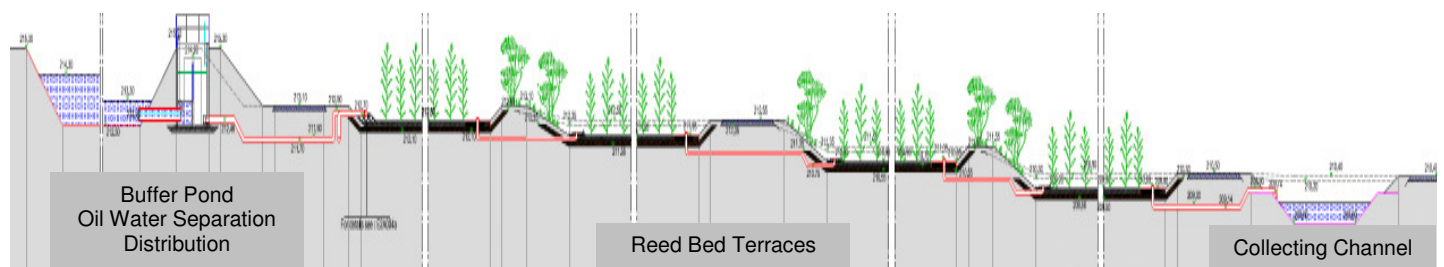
Nimr Water Treatment Plant – Reed Bed Cross Section
